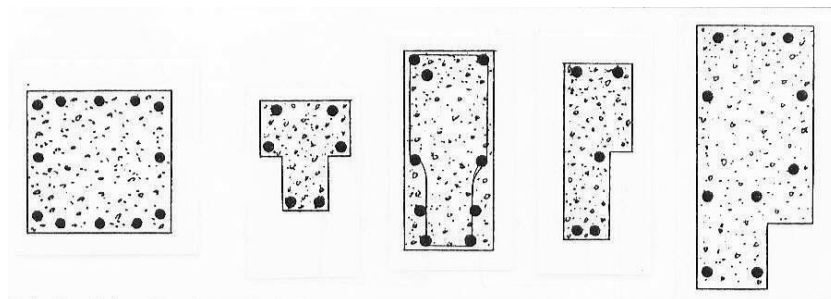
Hoist foundation plan views. Single-drum steam hoists were bolted to foundations like the one at left, and the other foundations were for various types of gasoline hoists. Source: Twitty, 2002:187, 241.
